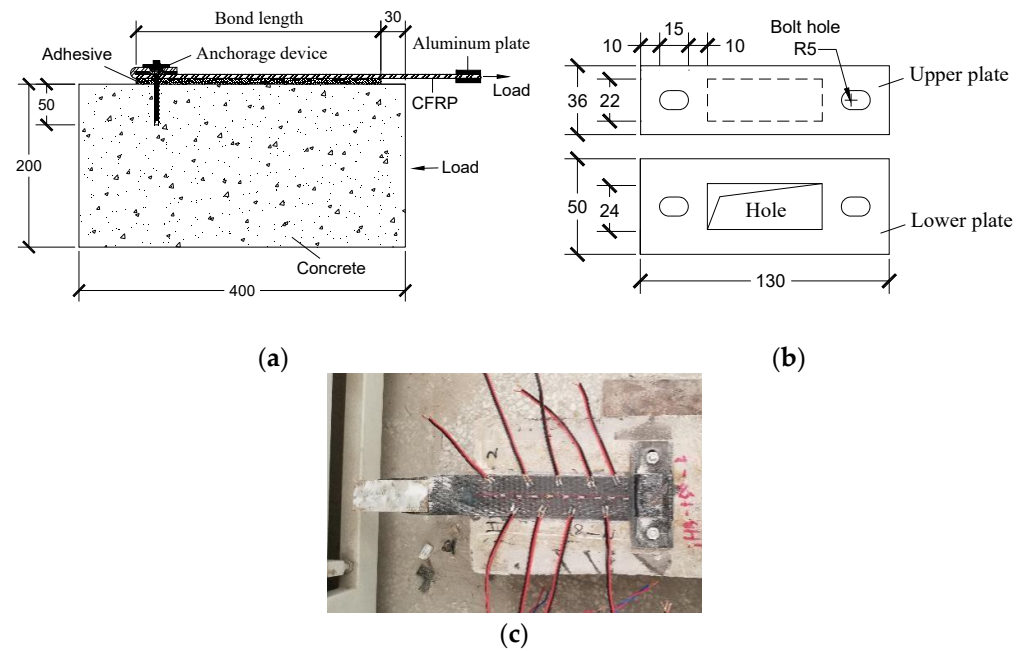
CFRP–concrete bonded joint with self-locked end anchorage: (a) Single-shear test joint with end anchorage; (b) Size drawing of steel plates; (c) Layout of strain gauges.
